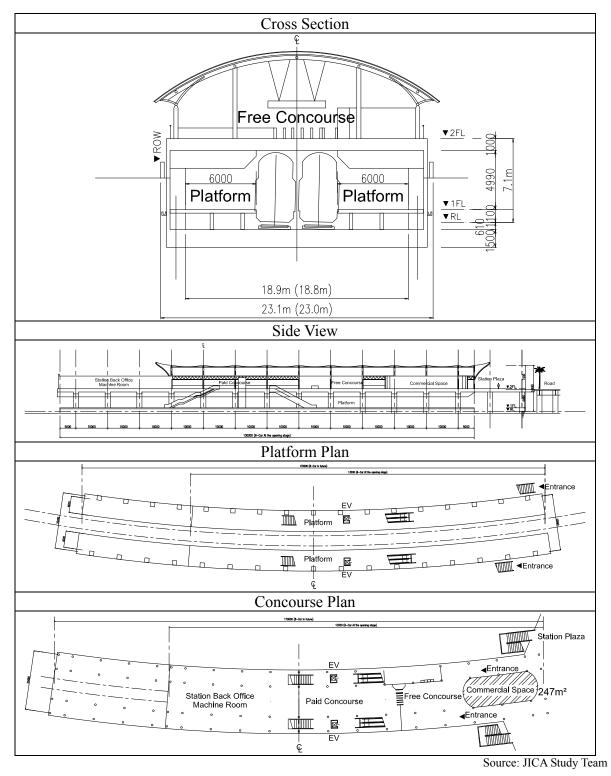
Station Plan (Culvert, Ground Concourse)
